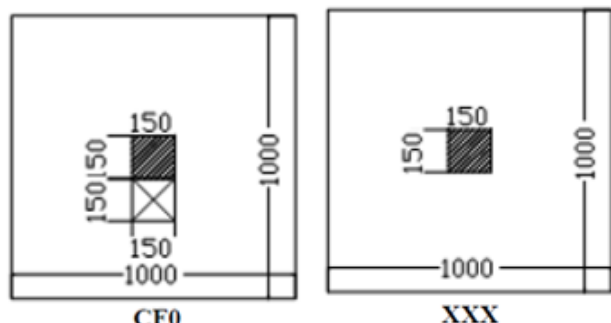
Plan View of Test Specimens, oukaili and Salman [1]
